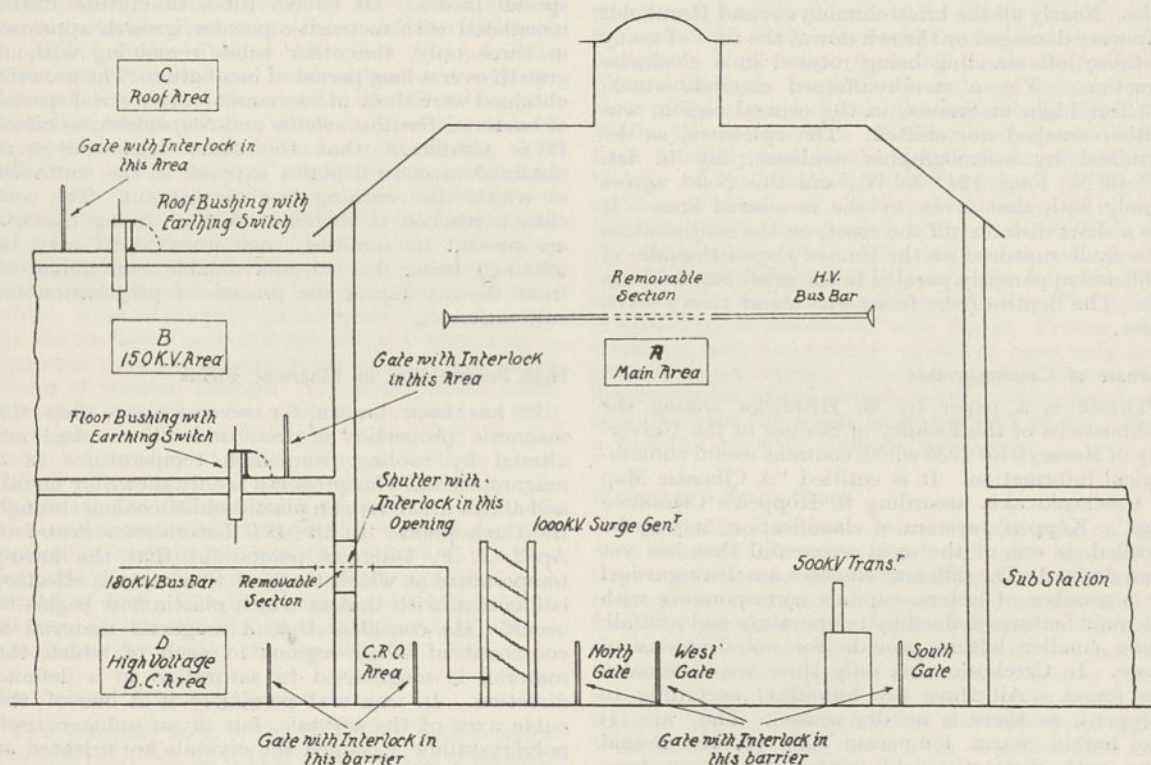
Arrangement of High Voltage Laboratory, Queen Mary College, London.
